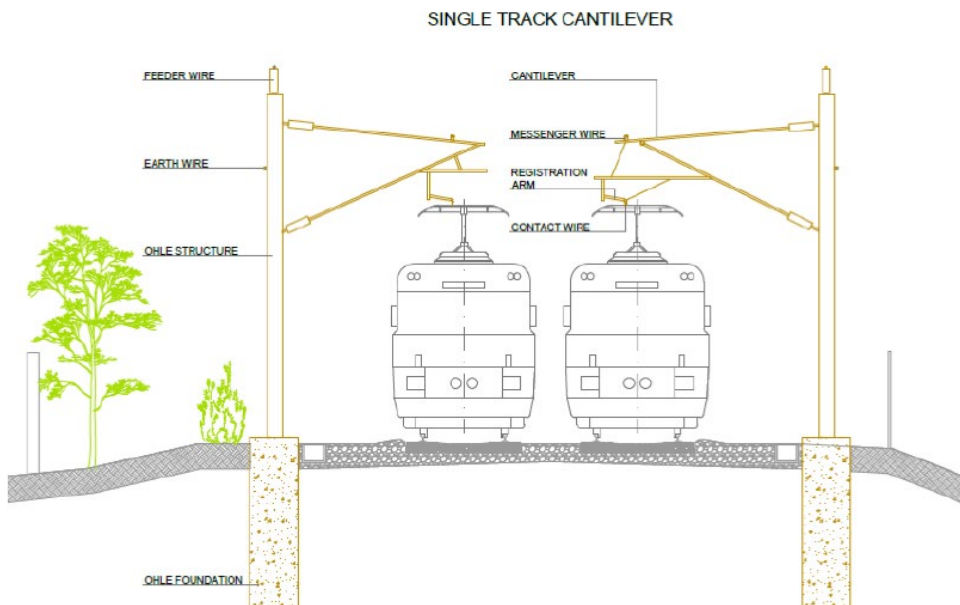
Single Track Cantilevers (STC) in 2-Track Section
